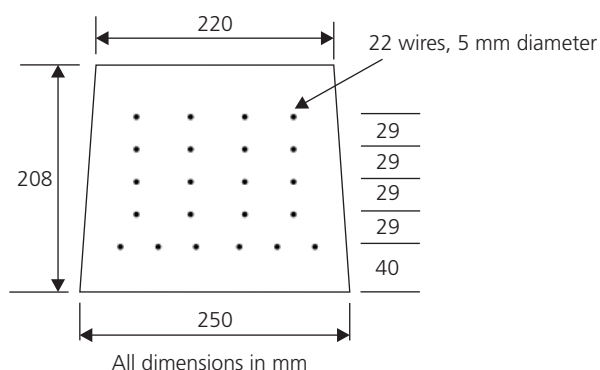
Cross-section dimensions of broad-gauge sleeper in case study
